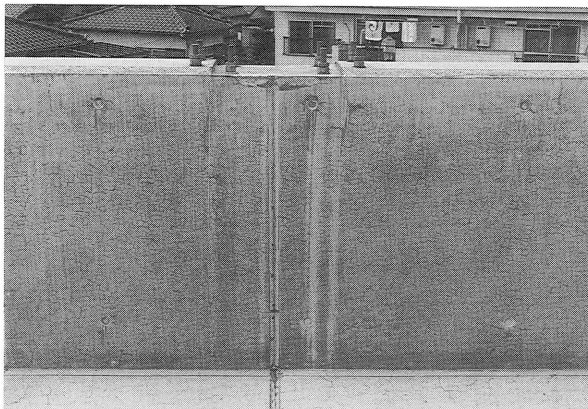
Quasi-hexagonal crack pattern formed on railing of viaduct wall
